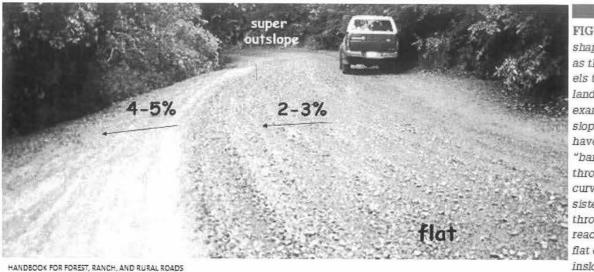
Road shape changes as the road travels through the landscape. For example, an outsloped road will have a steep or "banked" outslope through inside curves, a consistent outslope through straight reaches and a flat or slightly insloped shape as it goes through an outside curve. The road may have an outslope of 2-3% across the travel surface while the shoulder is more steeply outsloped to ensure runoff and sediment will leave the roadbed.
